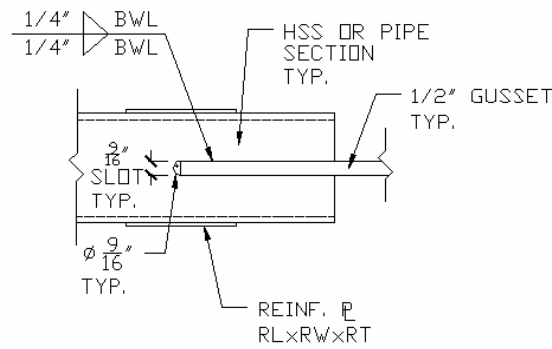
Typical connection detail for HSS and PipeSTD braces
